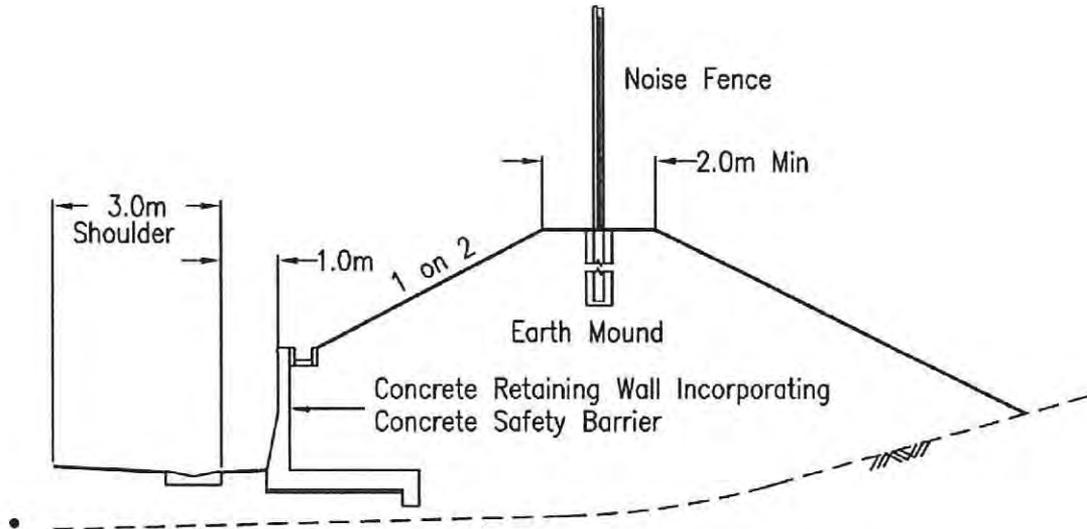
(a) Safety Barrier, Retaining Wall, Earth Mound, Noise Fence Combination
